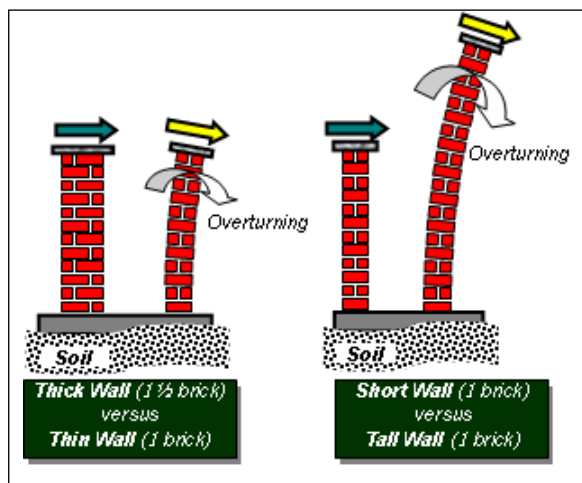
Basic Actions Acting on Masonry Walls in case of an Earthquake
